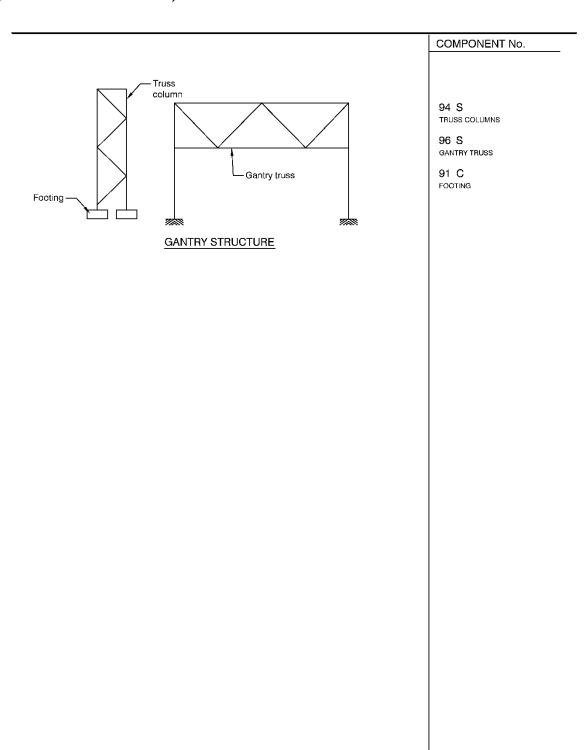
LTMS STRUCTURES. Sheet 2 of 2
